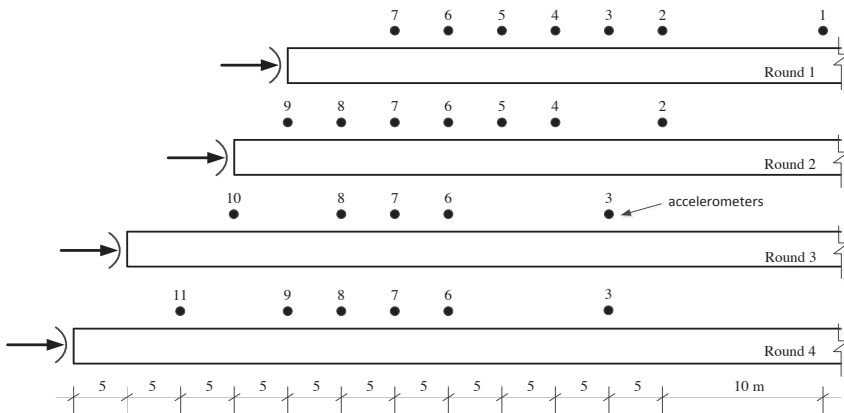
Tunnel with advancing front during four excavations rounds. Test layout with positions of measurement points, from [6].
